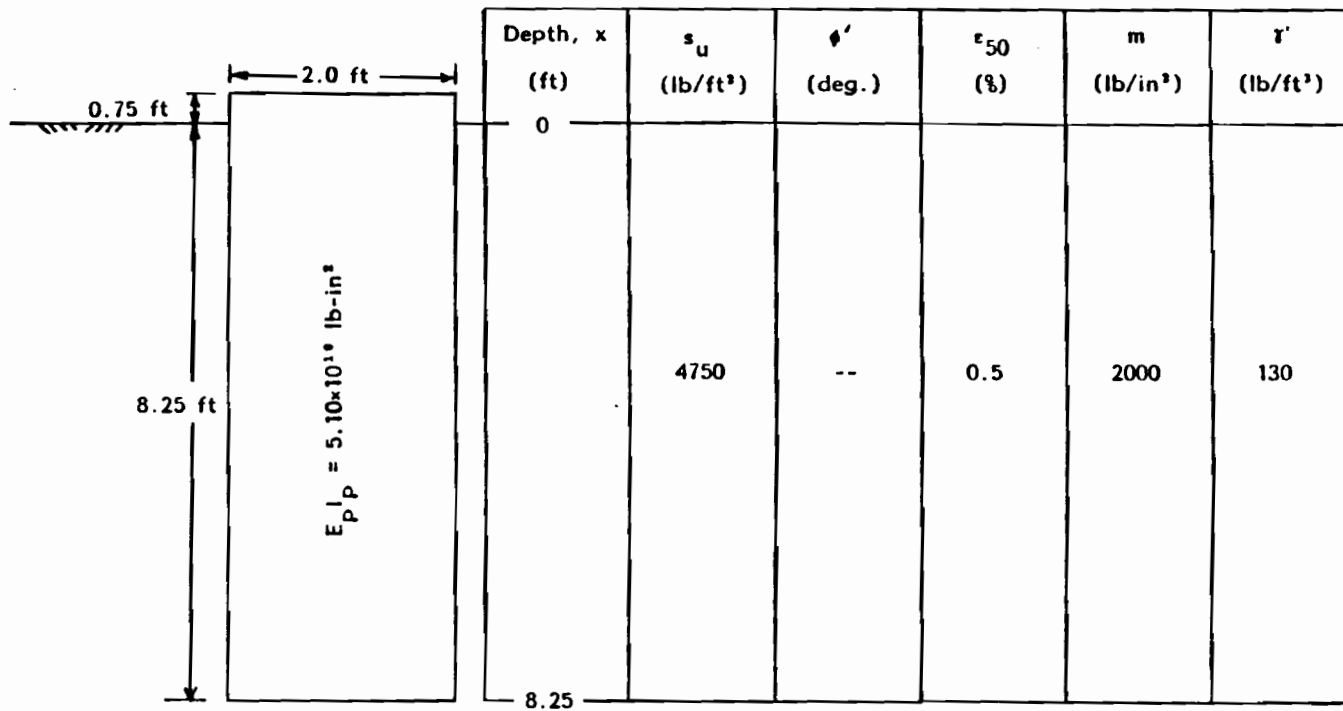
Soil and Drilled Shaft Data Used for COM624 Input, Shaft No. 23.
